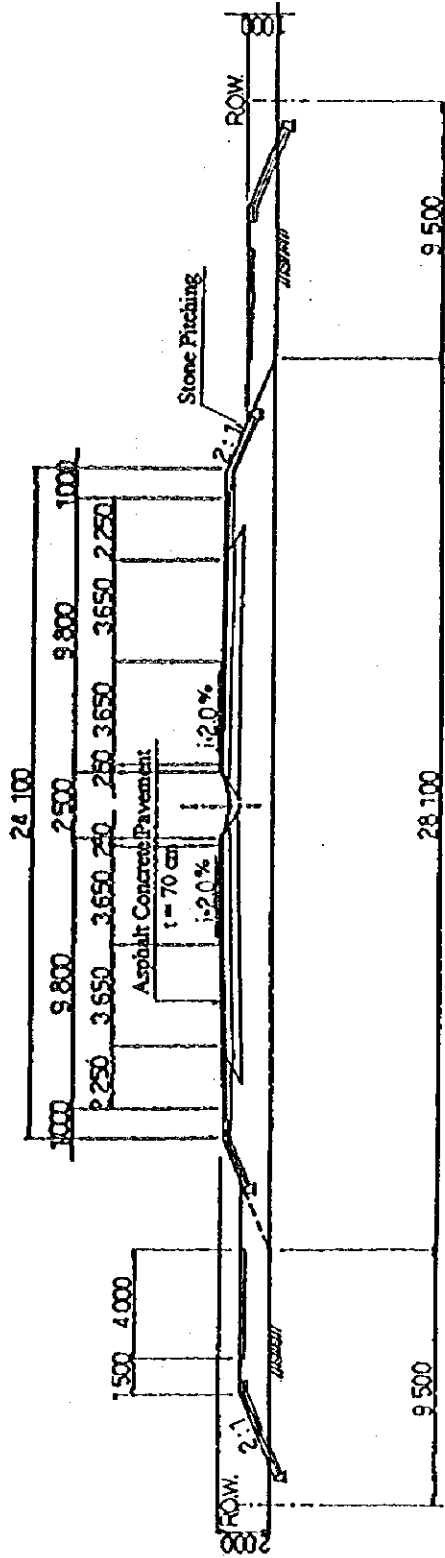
Typical Cross Section of Approach Embankment on the East Bank
